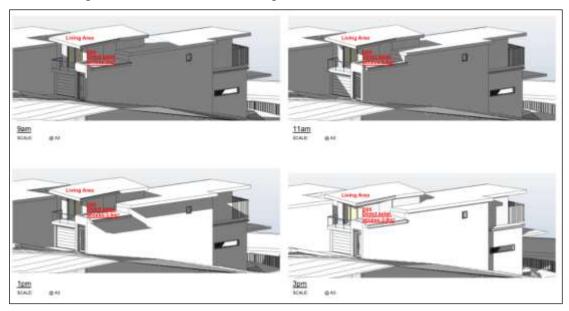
9am-3pm Solar Access to First Floor Rumpus/Living & Balcony
